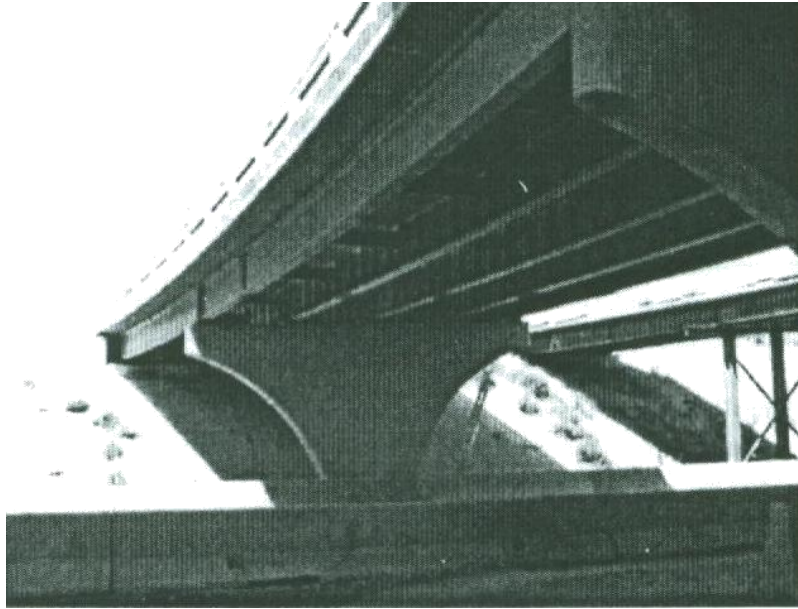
I-215 Curved Girder Bridge (Hsieh et al. 2006)
